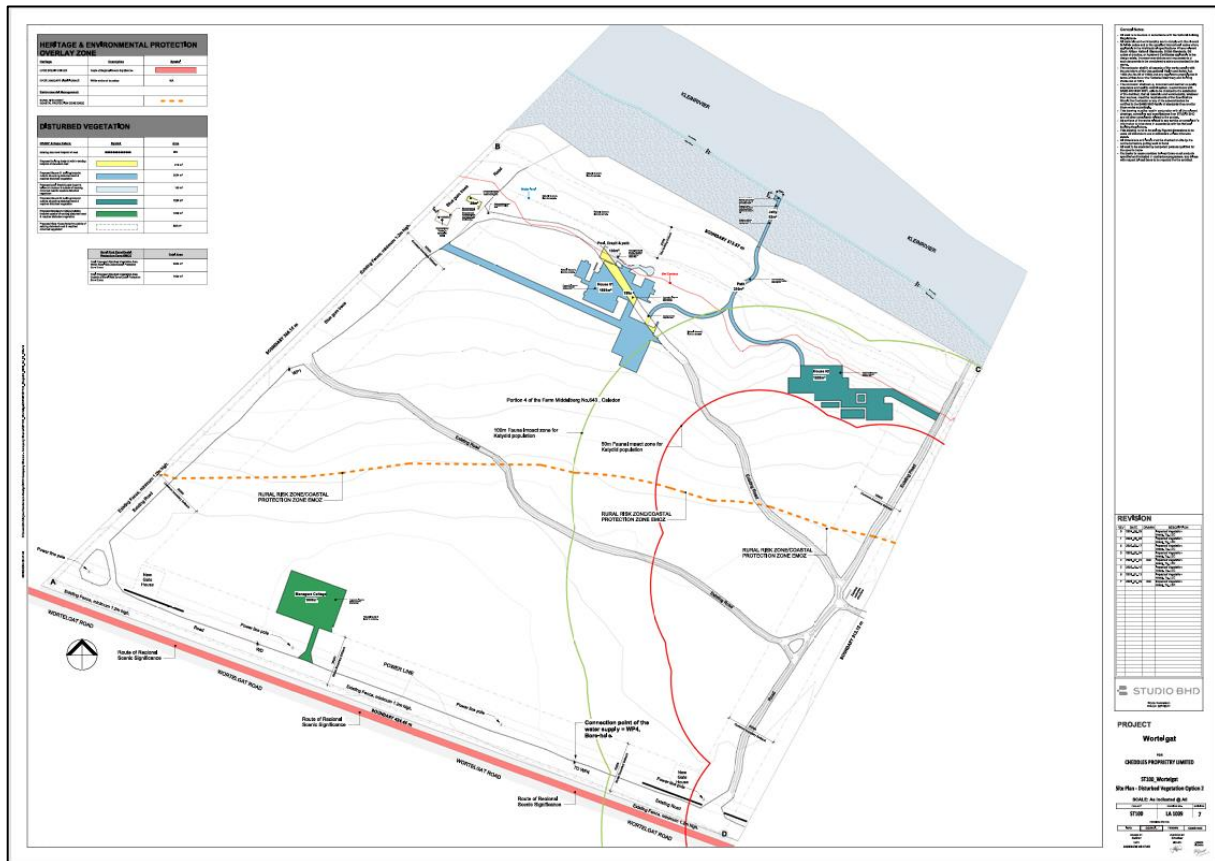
Proposed Site development plan – Preferred Alternative (Alternative 4).
